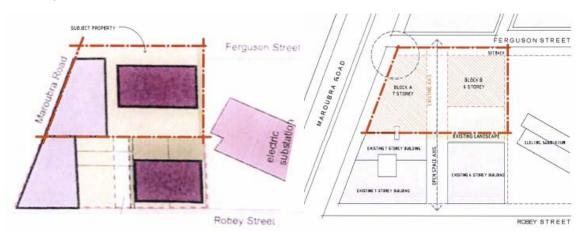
Insert from Block 9 building envelope (left) and proposed layout (right).
